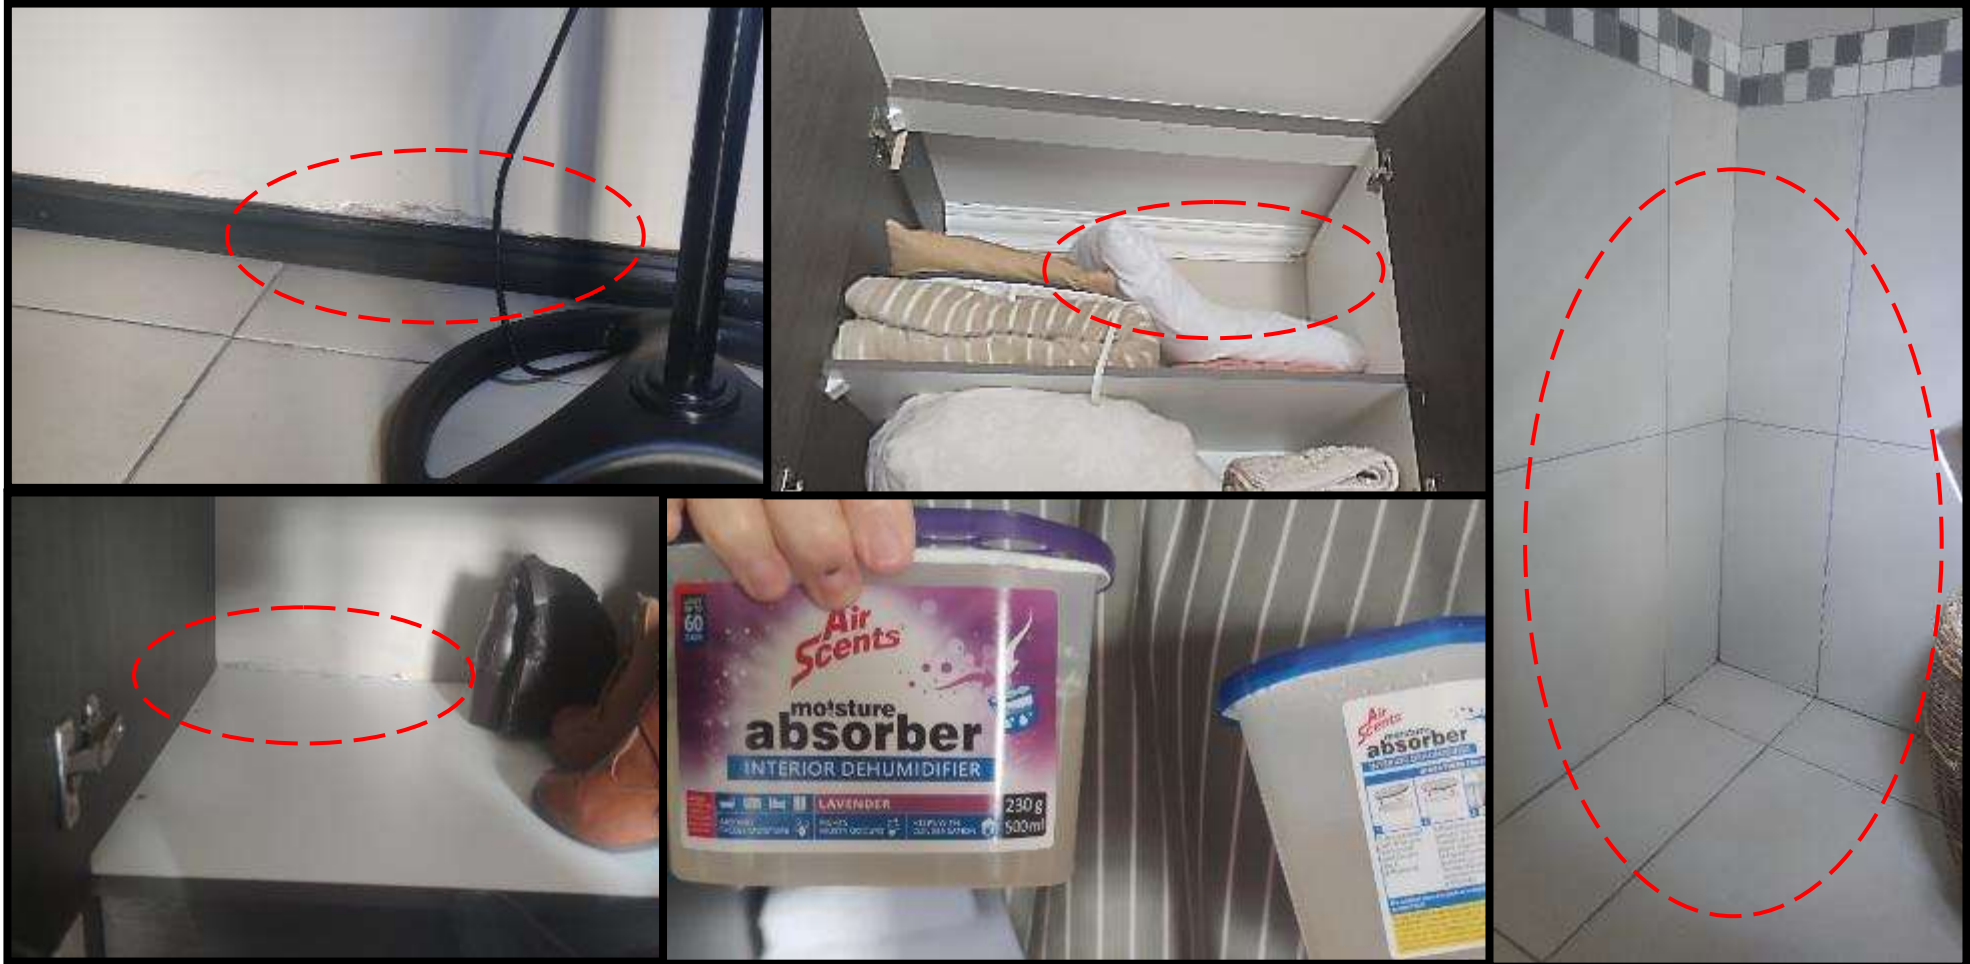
Showing the water damage on the bedroom walls, wardrobe and damp bathroom walls.
